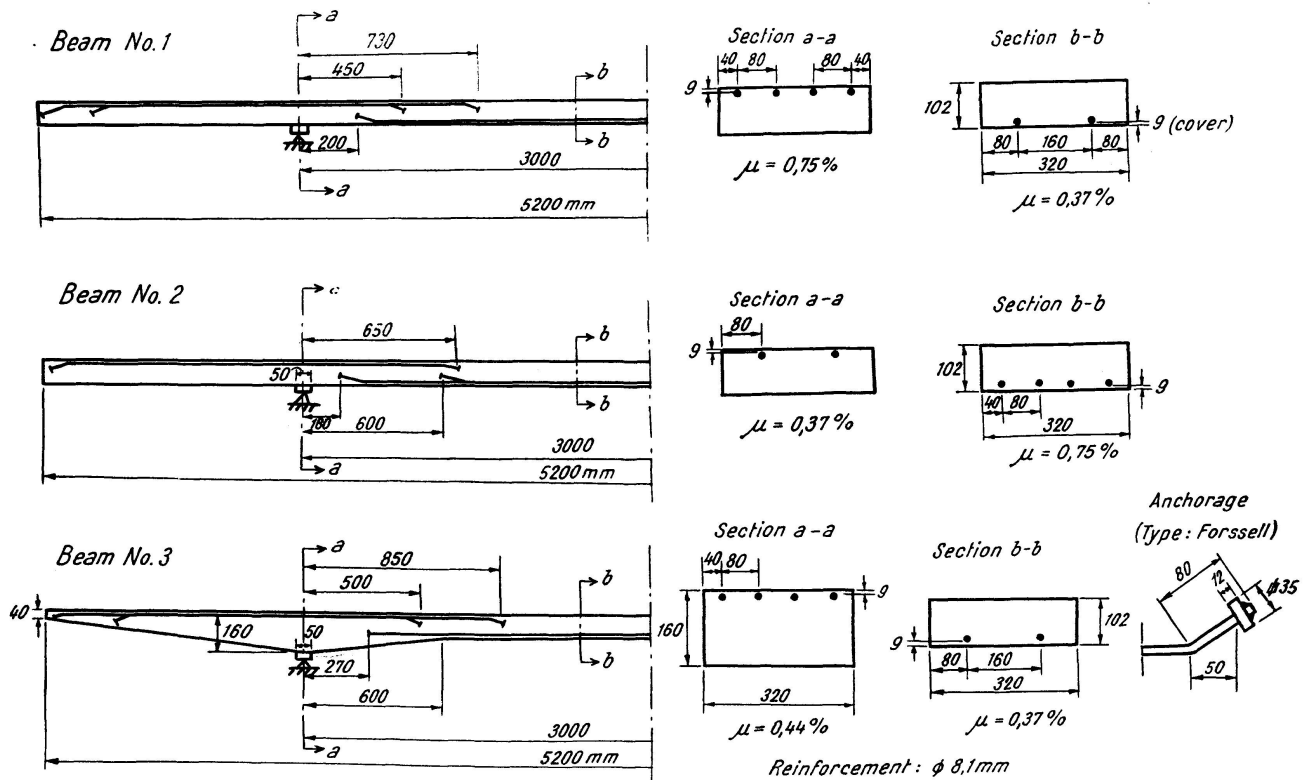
Dimensions and reinforcement of the beams subjected to the tests
